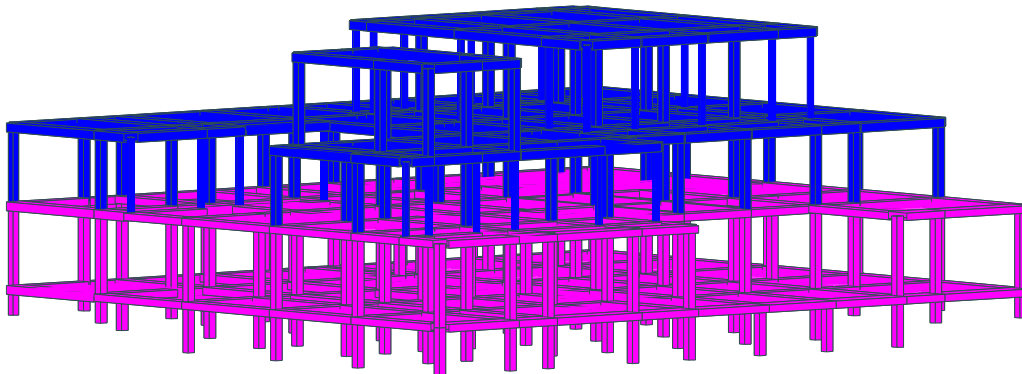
Block D1.3 assumed construction sequence. Pink: commenced in 1996. Blue: completed by 2007. Lift and stair cores not shown.
